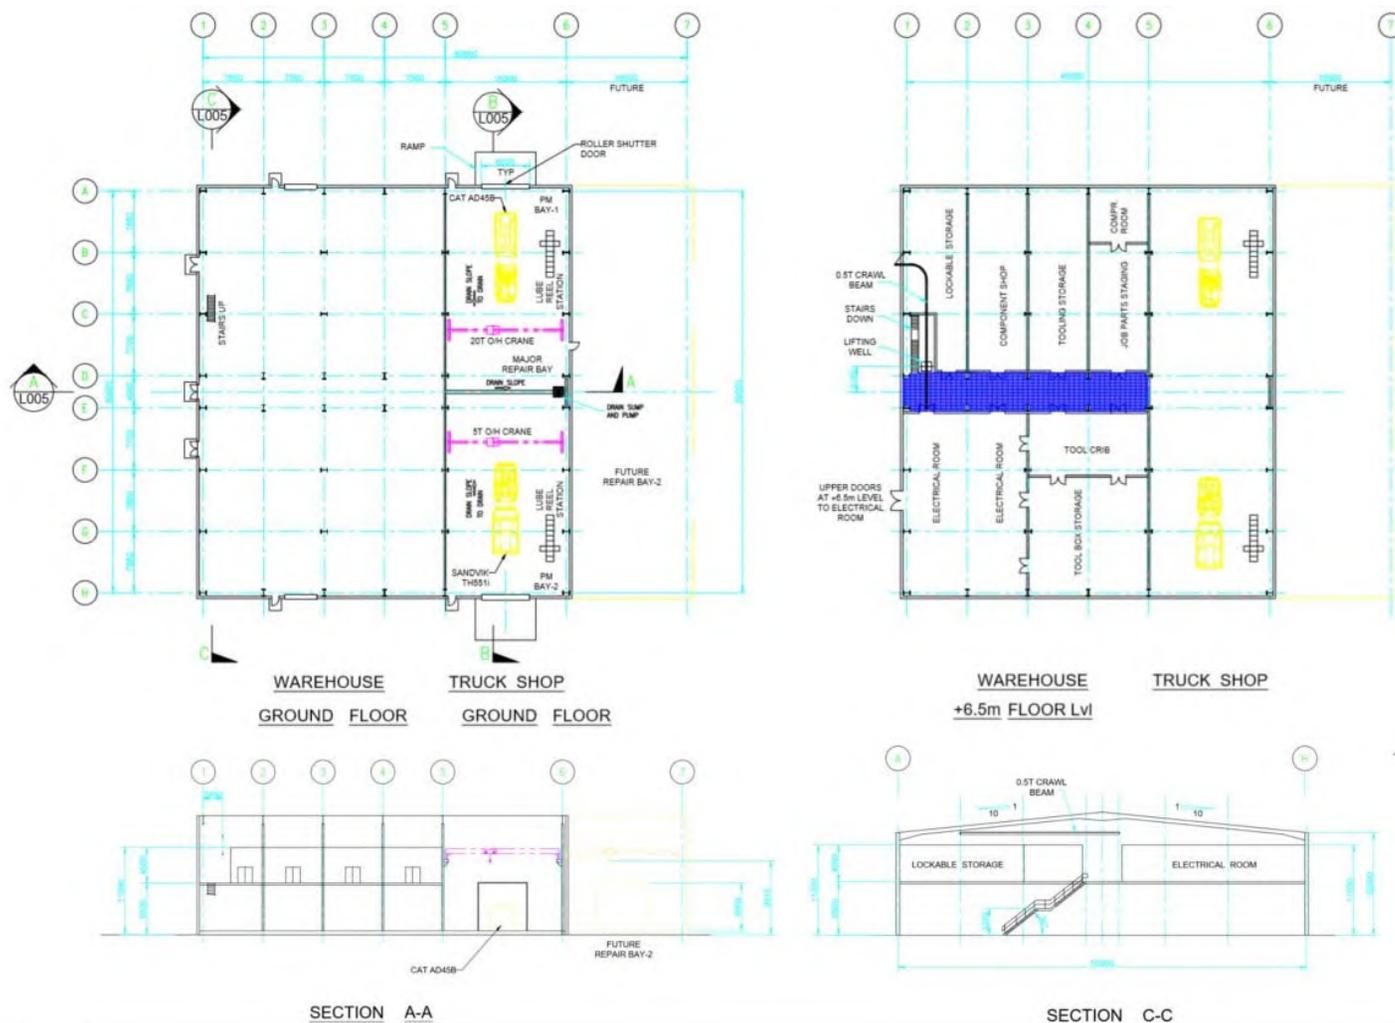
Truck Shop and Warehouse Layout (Halyard, 2020)
